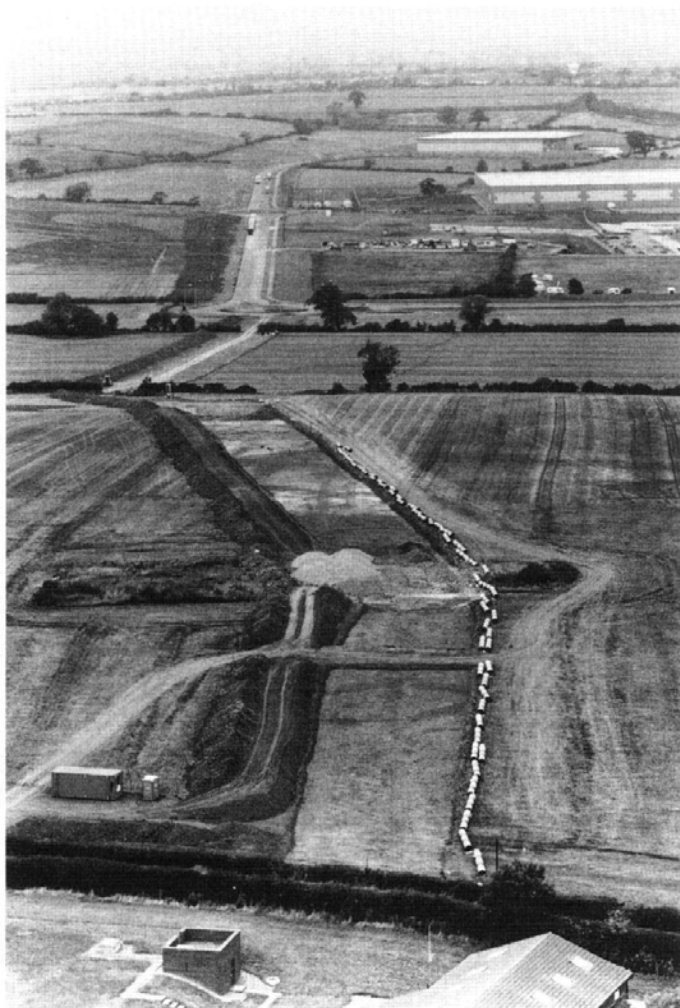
Great Houghton: Aerial photograph of site under excavation, looking south-west (by courtesy of Crawshaw Robbins & Co. Ltd)
